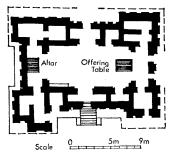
Floor plan of temple VII in Eridu, about 3500 B.C. This basic plan was used in later temples such as the ones in Khafajah and Ur (see 31).
